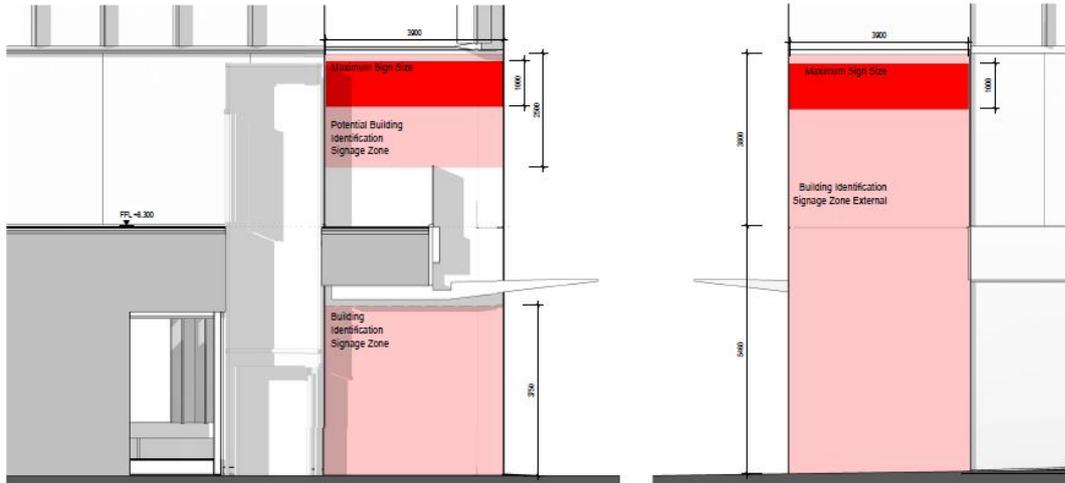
Tower - Pitt Street building ID signage to either side of the building entry wall.
